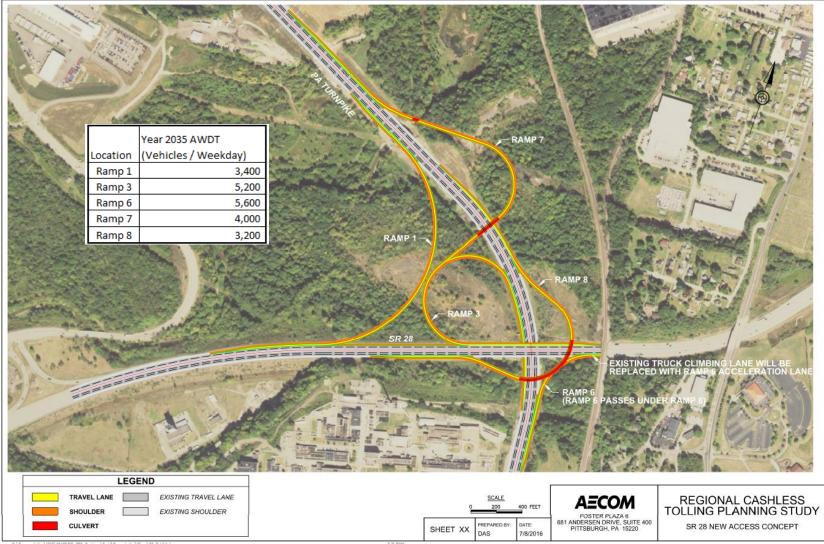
SR 28 New Access Concept Alternative (Partial Access)
